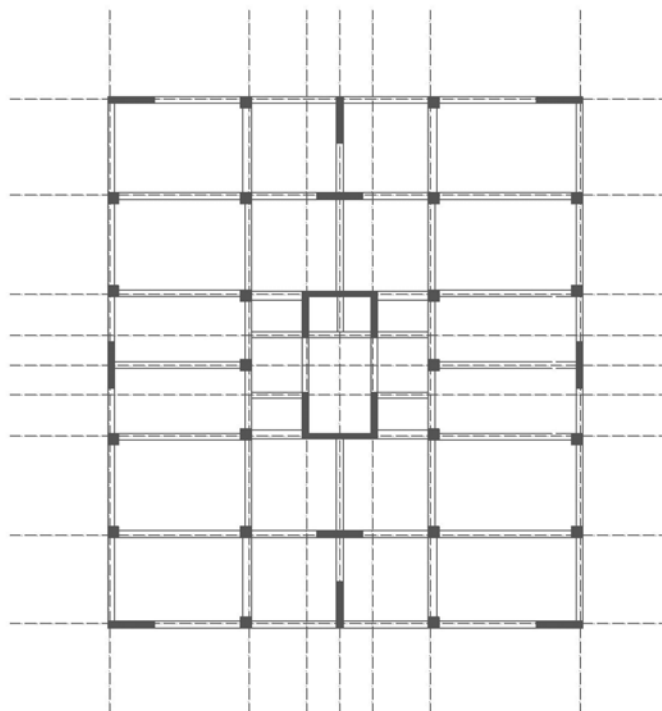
A Building in Bolu with Regular Structural System 2008
